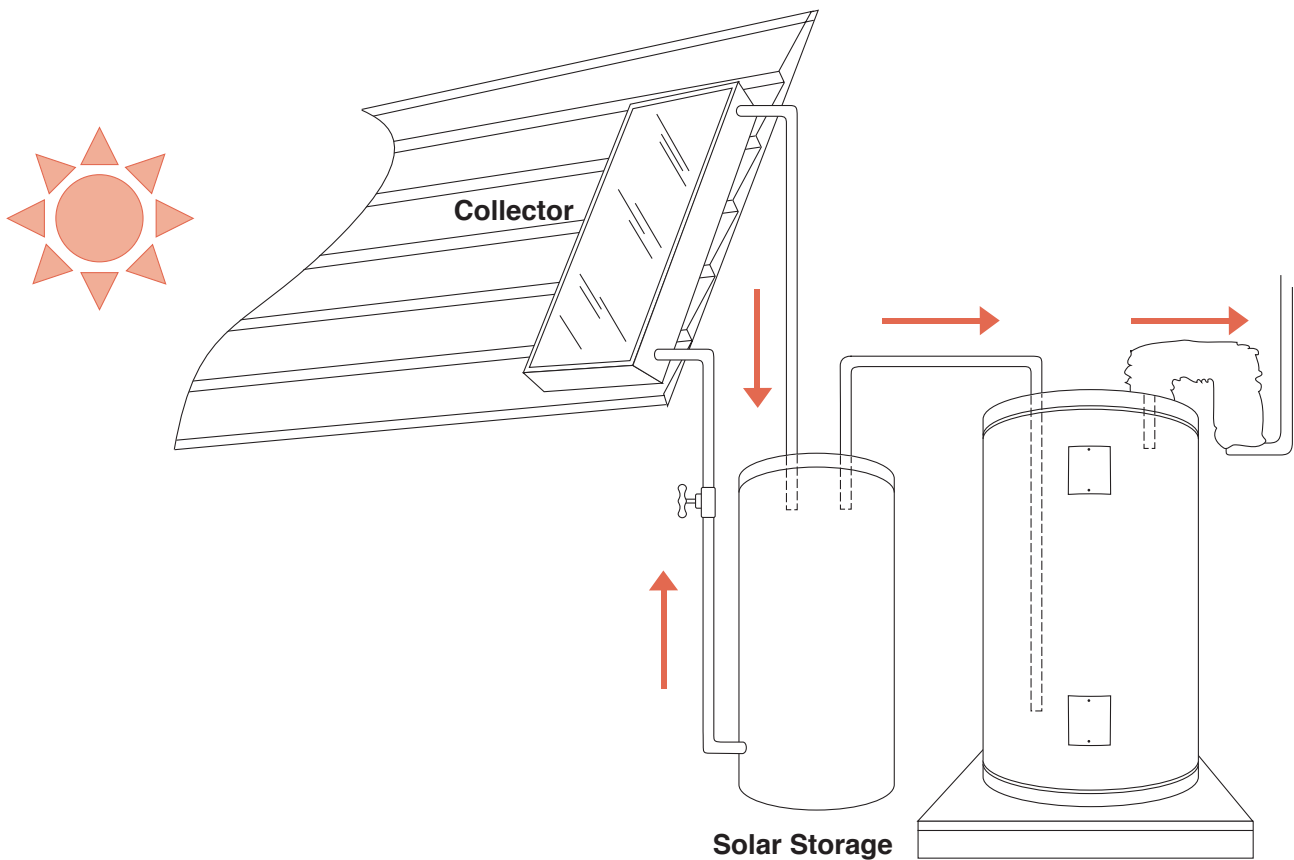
Solar water heaters typically consist of a roof-mounted collector and storage tank in the house.
